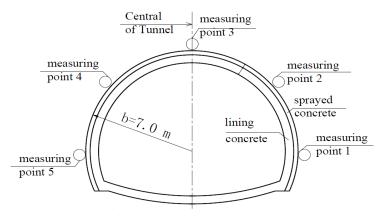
Section 1 of Baiyanshan tunnel and the test arrangement
